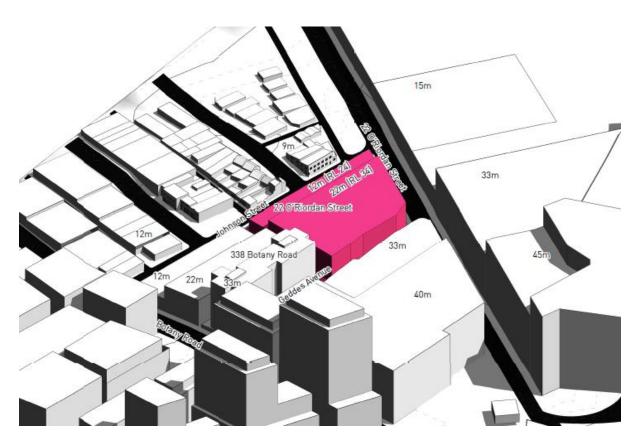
Isometric view of proposed building envelope - south-west along O'Riordan Street
